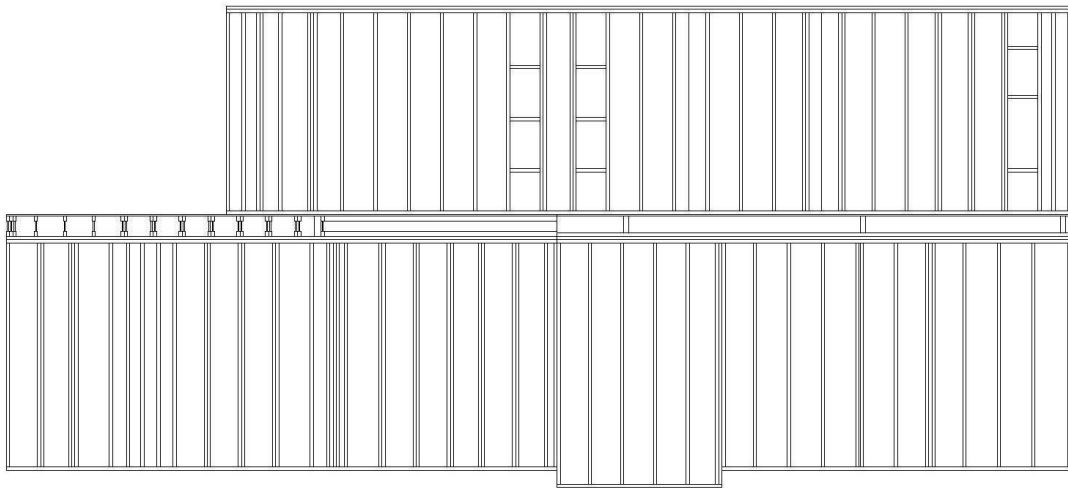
Detached house DH4 east-side elevation with the as-built studs installed on the first and second floors including the rim joist area.
